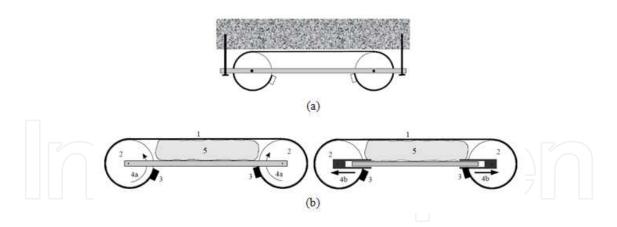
Prestressing device developed by Stoecklin & Meier [17]: (a) Placement of the prestressing device under the beam; (b) Two ways of prestressing a CFRP strip.
